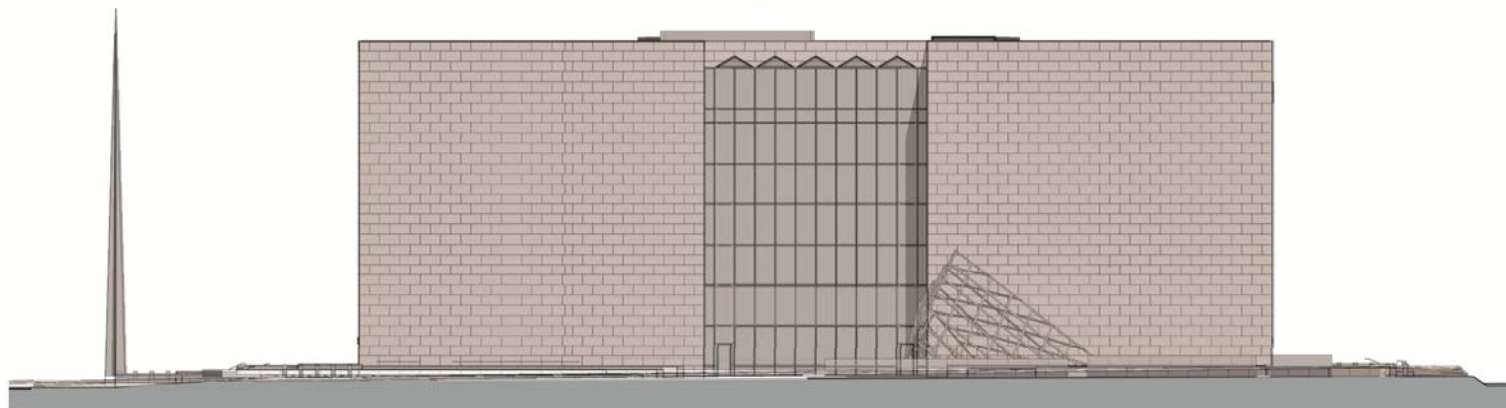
6: Existing west elevation along 7th Street, SW.(Source: QEA.)
